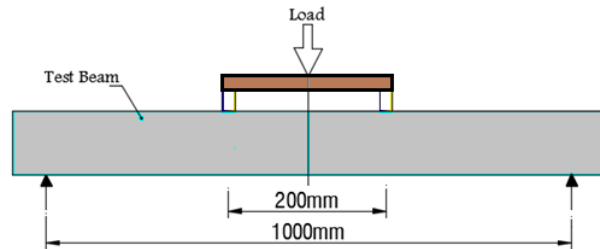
Details of loading set-up for the Izocrete beam specimens.
